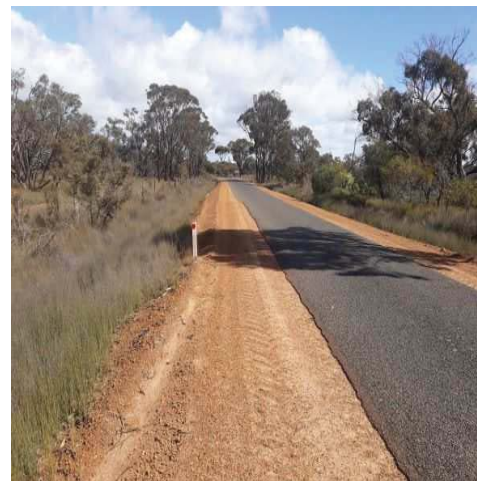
Kojonup-Frankland Road SLK 40.51, facing south (Shire of Kojonup, 2018b)
